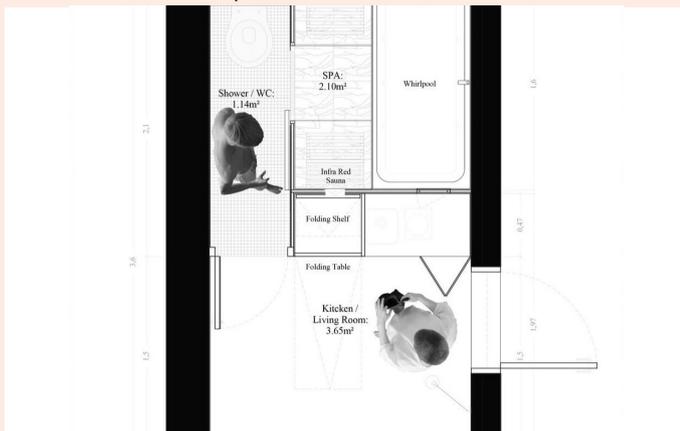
Plan lower level: living room / kitchen, spa, shower / toilet
